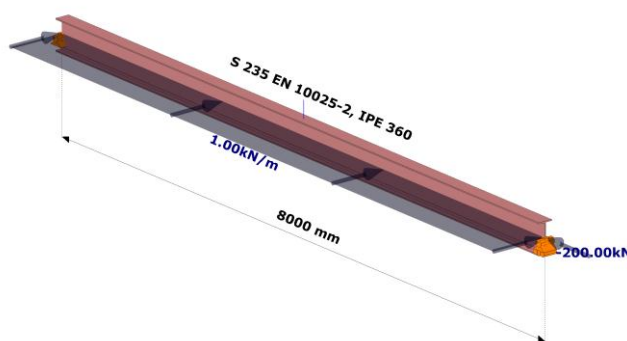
Simple fork supported member with IPE360 section subjected to transverse load and compressive force
